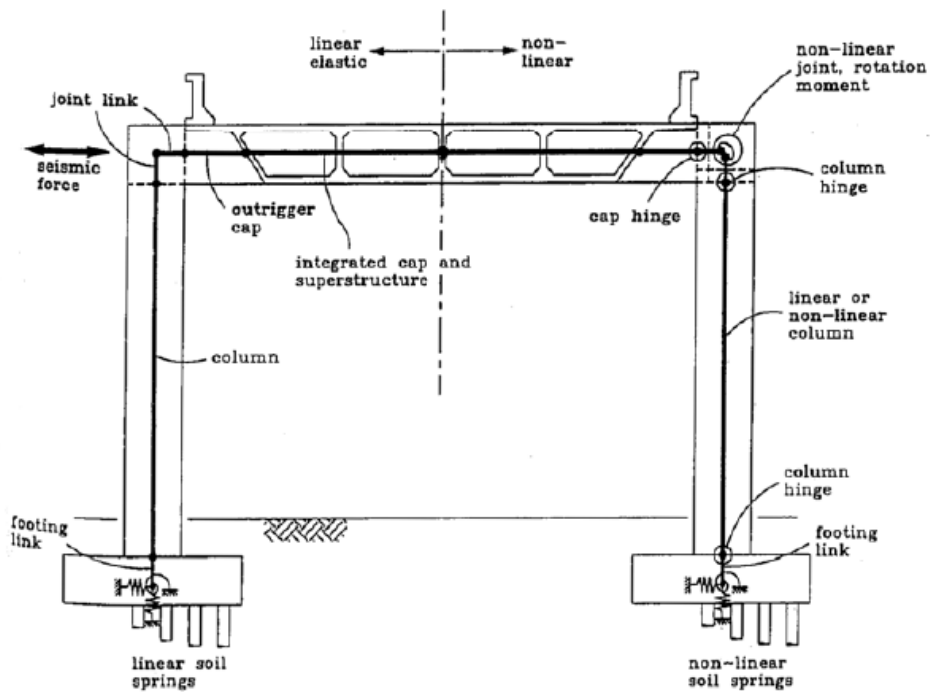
Multiple Column Bent Model (Priestley, Seible, & Calvi, 1996)
